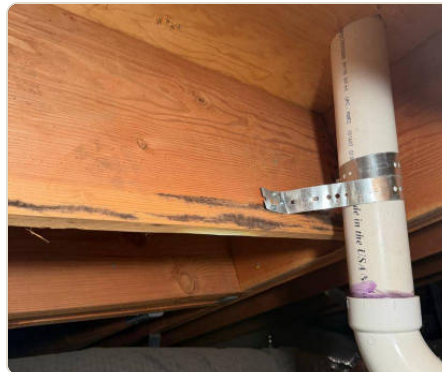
Dark staining running along a joist edge next to a strapped PVC line passing through framing.
